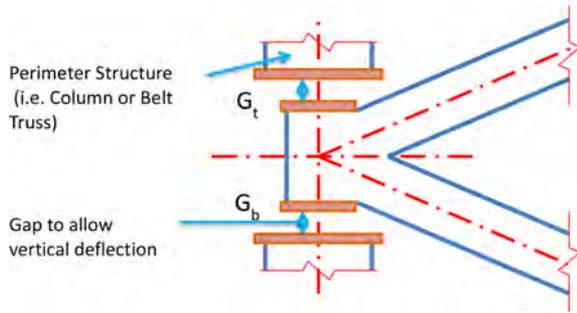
Typical Details for Outriggers tips Details used in Cheung Kong Center.
